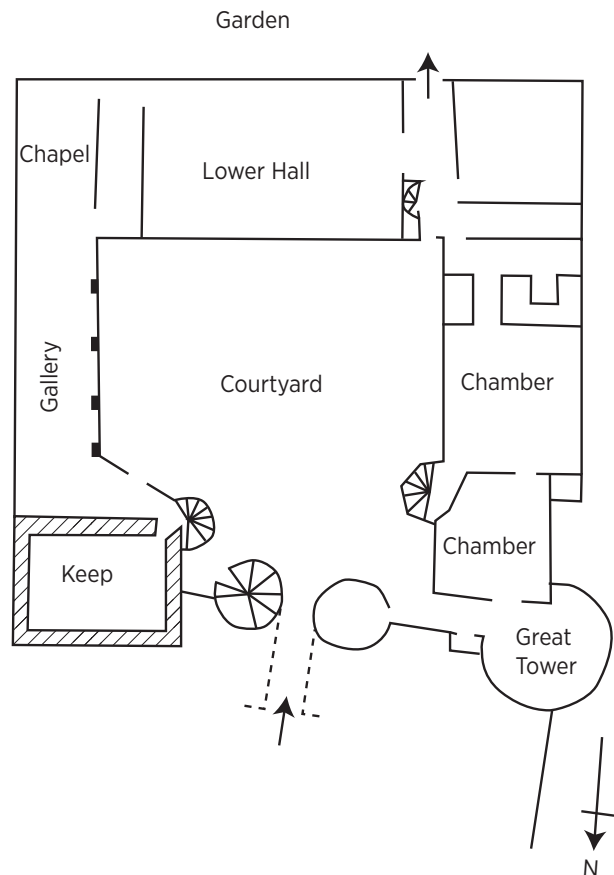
Fougères-sur-Bièvres Castle: ground plan
